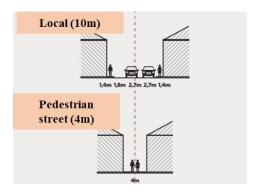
Road type and size Source: Mbeya urban planning guides
